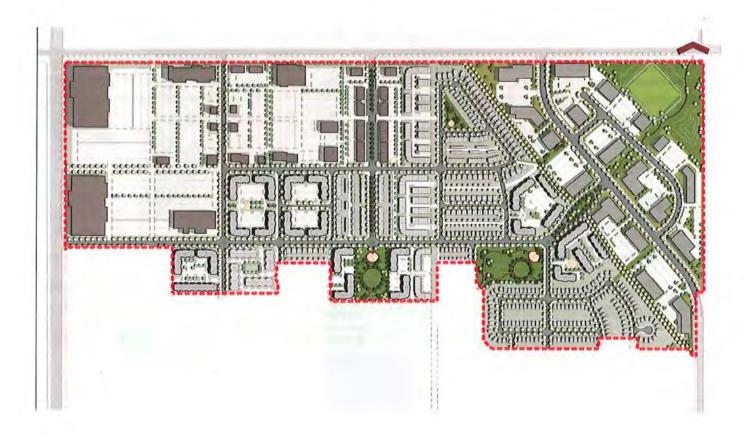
Westerra - Phase One Concept Plan Illustrative Plan - Conceptual Overview
